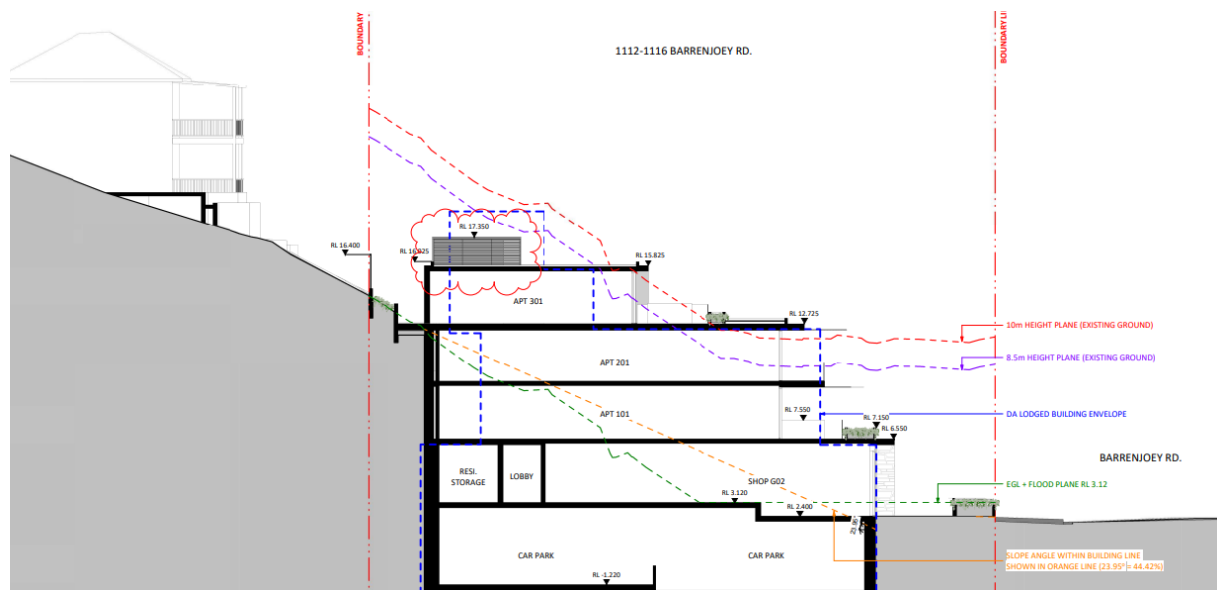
Plan extract showing building sitting well below height standard at eastern edge of the site.
